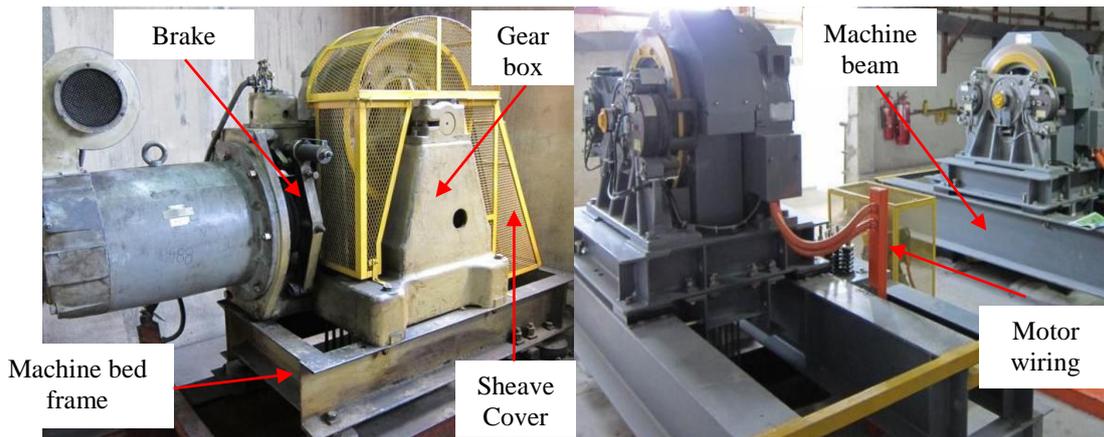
Geared traction machine (left) and gearless traction machine (right) at machine room
